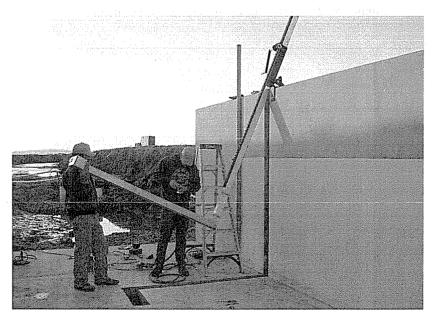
West Delta Drain Monitoring Site at Sand Dam. Similar site proposed at the Hereford Drain outlet.
